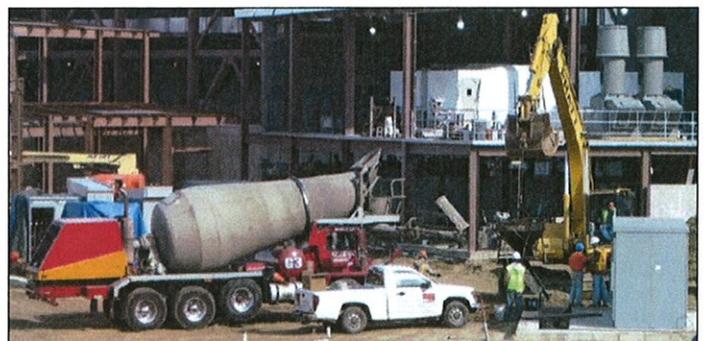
Concrete work is winding down, well in advance of the coldest days.
